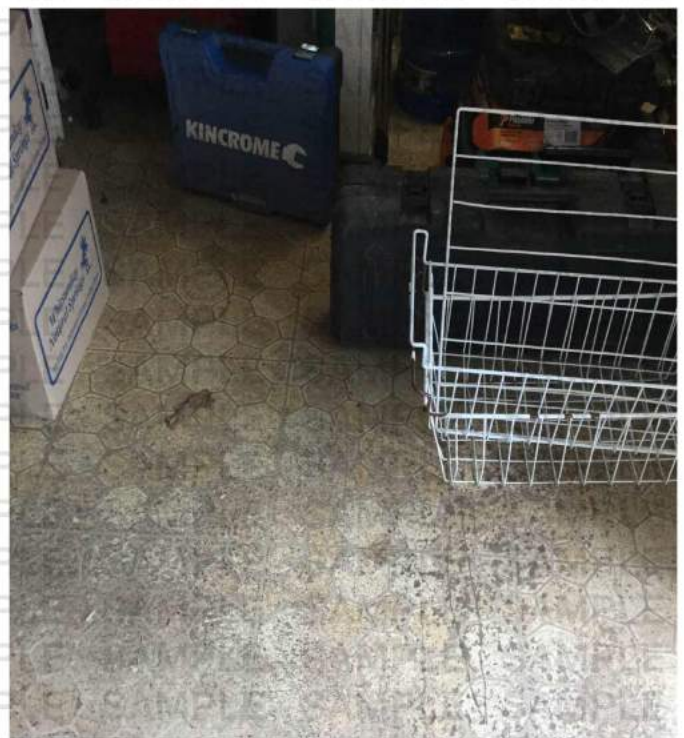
Office building rear slab moisture underneath vinyl flooring. ACM Materials to be verified.
